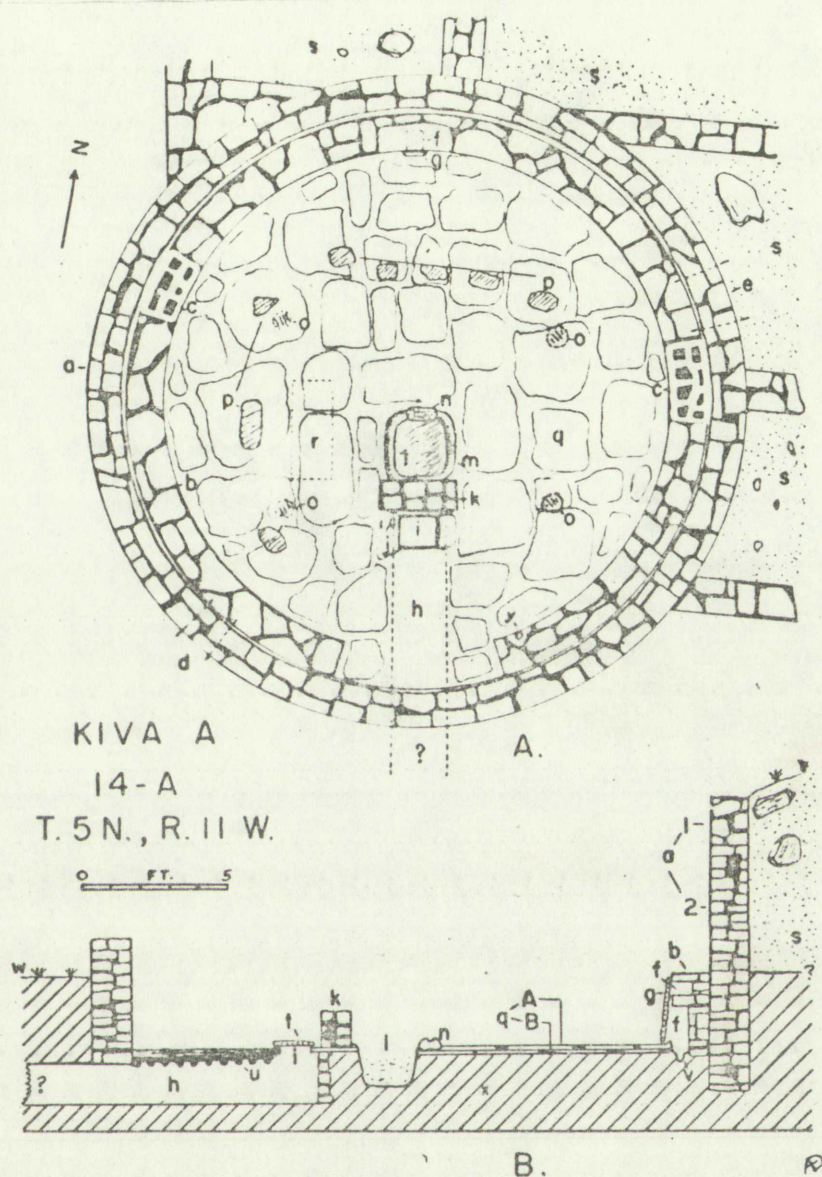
A. Ground plan and B. cross-section of Kiva A, site 14-A: a. kiva wall (1. selected sandstone masonry and 2. pecked sandstone masonry), b. bench, c. pilasters, d. window looking onto the plaza, e. opening from kiva into unexcavated room, f. "Katchina niche", g. sandstone slab covering niches, h. ventilator shaft, i. ventilator shaft opening, j. sandstone block which probably was used as a prop for the ventilator cover in regulating the draft, k. deflector, l. firepit, m. adobe lip, n. sandstone block in adobe lip with the ladder hole carved into it, o. position of roof support posts, p. small slabs of sandstone arranged on the floor, q. flagstone floor (two layers), r. sub-floor vault beneath floor B, s. unexcavated rooms, t. ventilator opening cover, u. roofing over ventilator shaft, v. "sipapu", w. original ground-level, x. sand and adobe and y. paint mortar.
